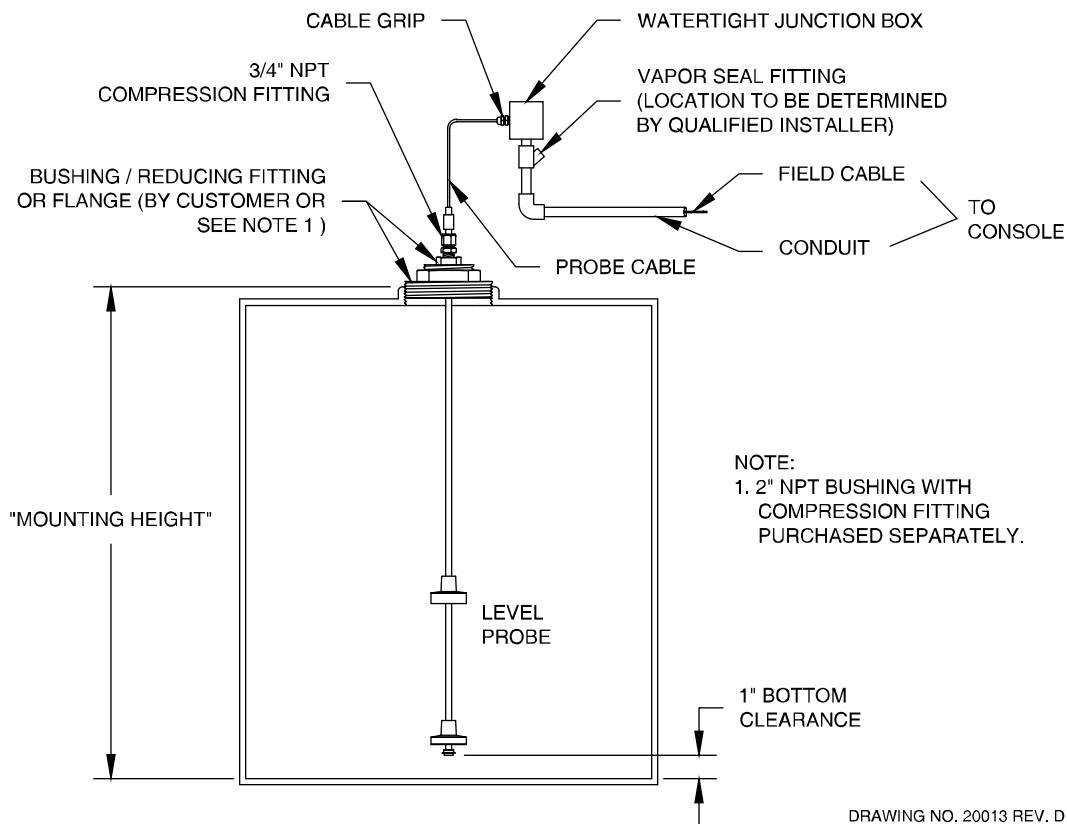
Reducer Fitting or Flange Mounting for Aboveground Tanks
